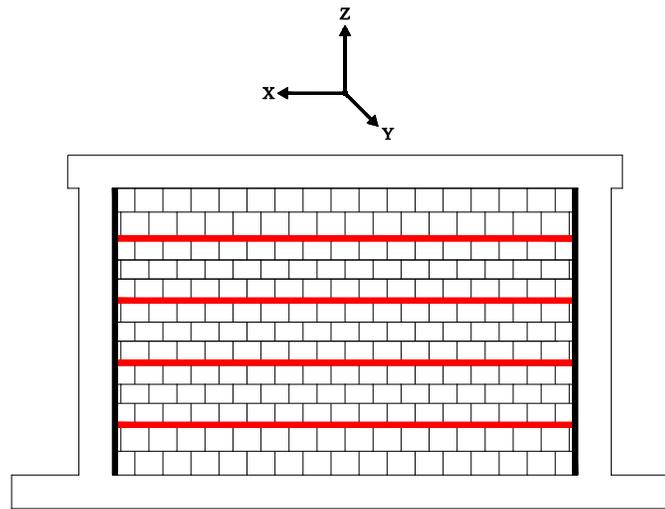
Composite rubber/masonry wall within reinforced concrete frame. The horizontal rubber joints are shown in red and vertical joints are in black.
